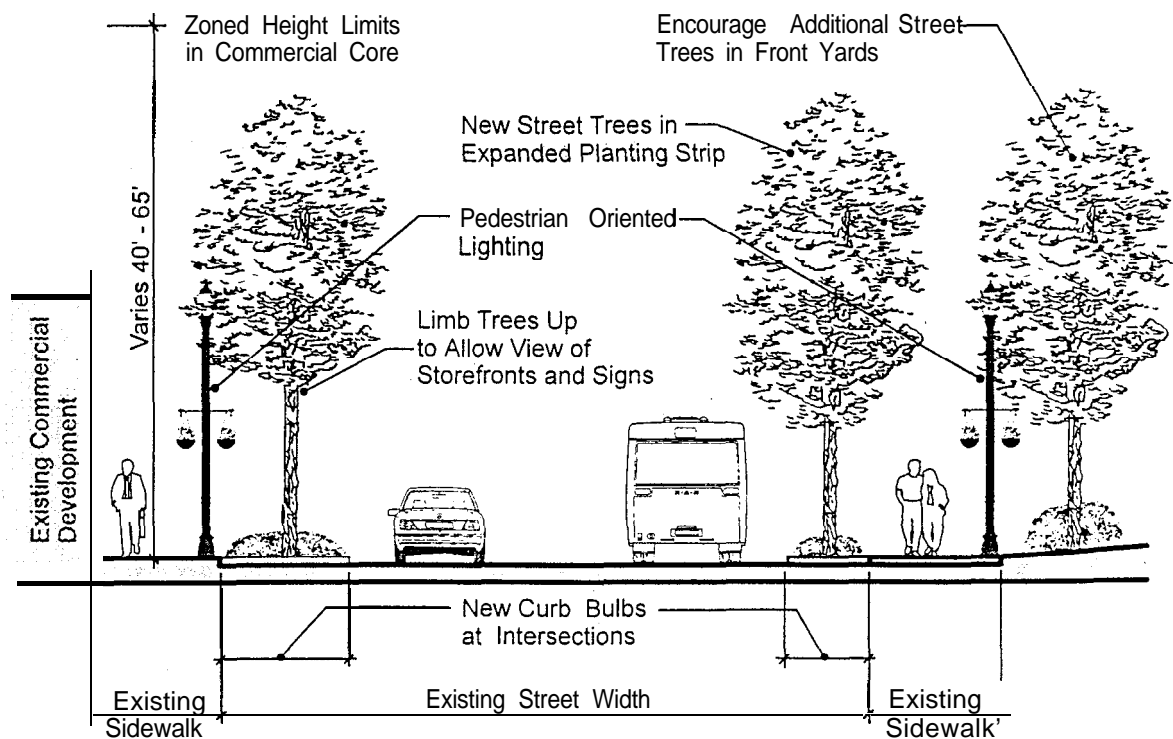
Typical Commercial/Residential Area Street Section, with a Possible Option for Street lights
